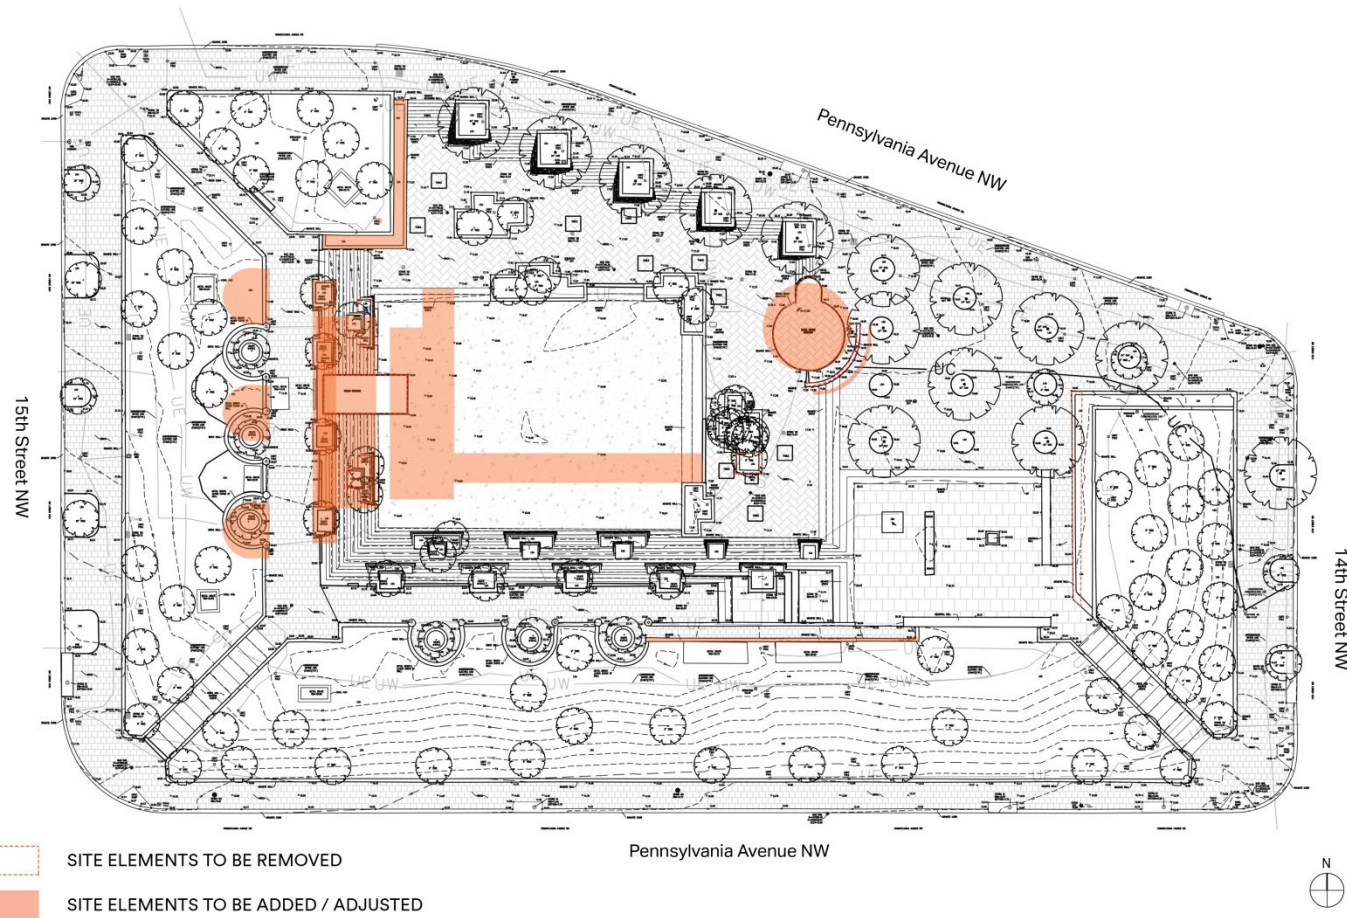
Alternative B: Integrated Sculpture with L Walkway Structural Changes to Pershing Park Site
